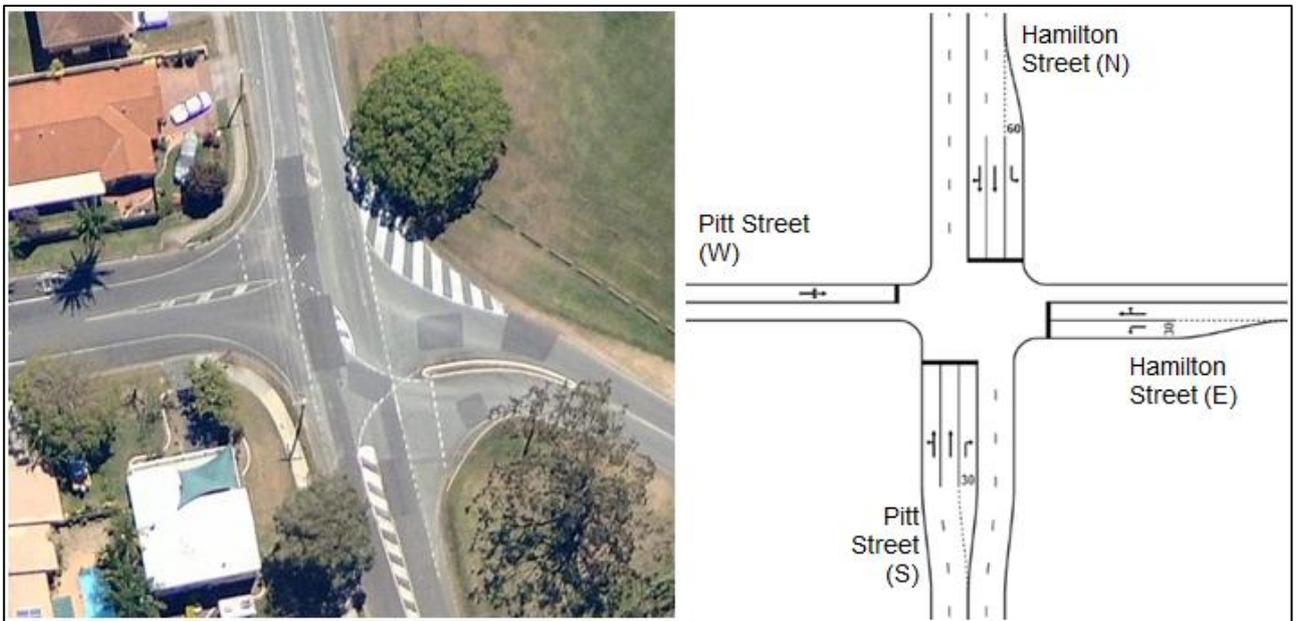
Hamilton Street/Pitt Street – Existing Layout
